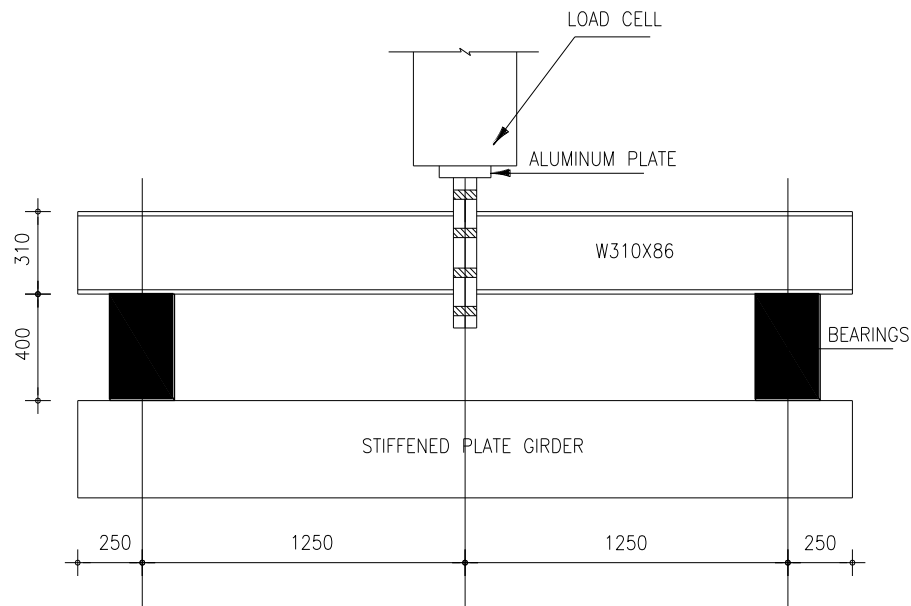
Schematic elevation for the test set-up of the full-scale tests (dimensions in mm).
